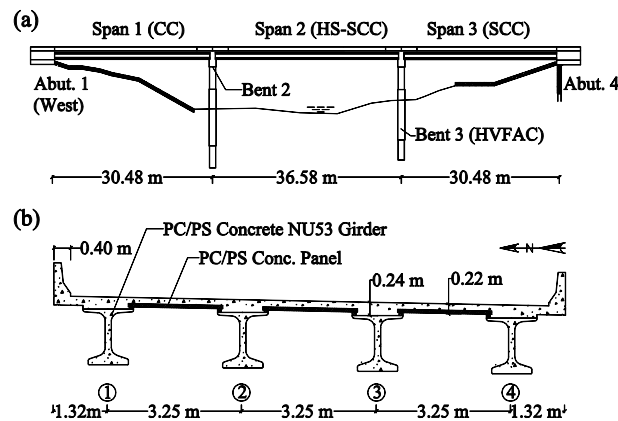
Bridge A7957. (a) elevation; (b) cross-section.
